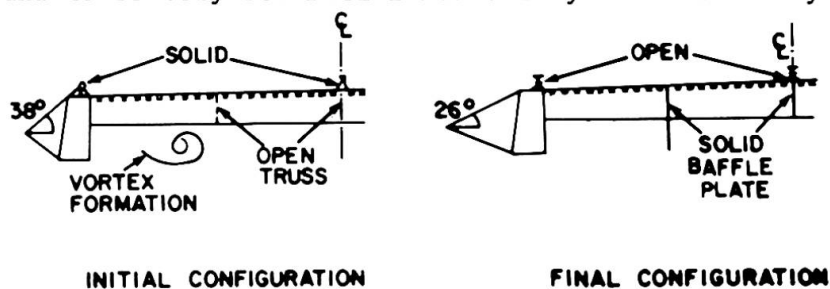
DAMES POINT BRIDGE CROSS-SECTIONS
